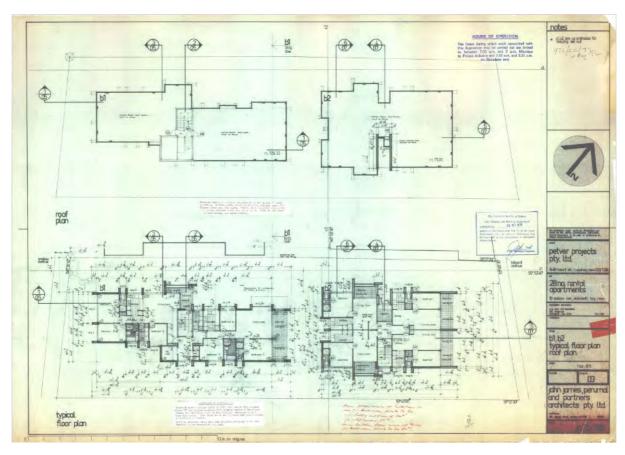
Submitted architectural drawings, Building 1 and 2 typical floor plans, 1972. (Source: City of Sydney Archives, A-00590018
